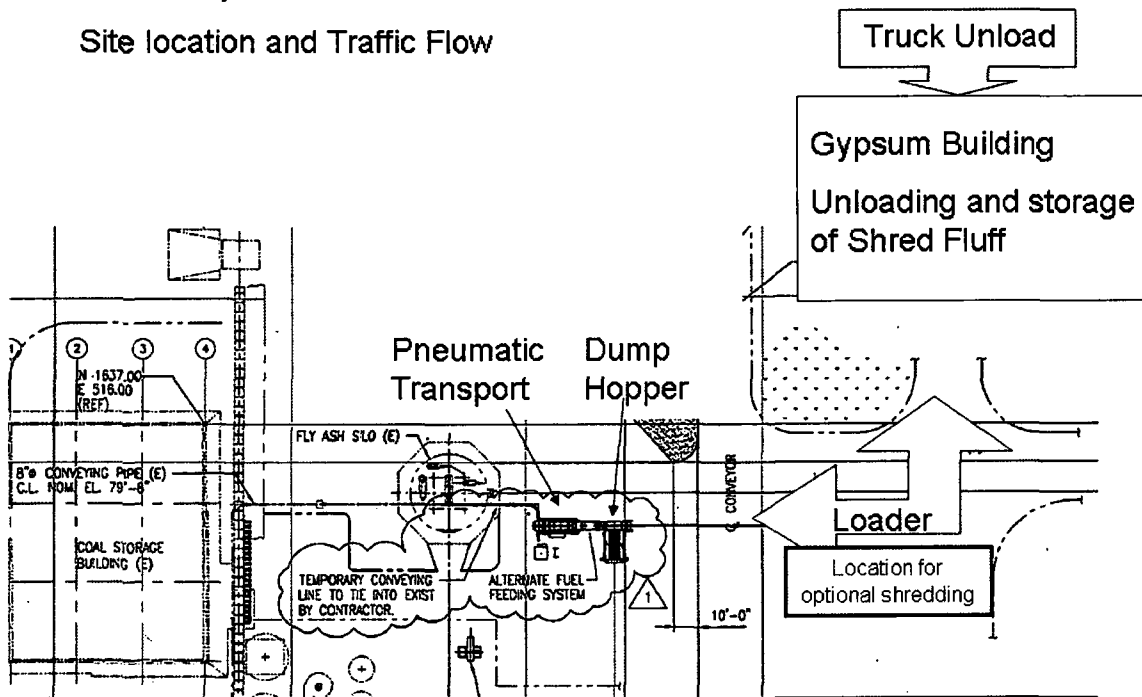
Layout of ASR storage, handling, optional shredding and input to system.
